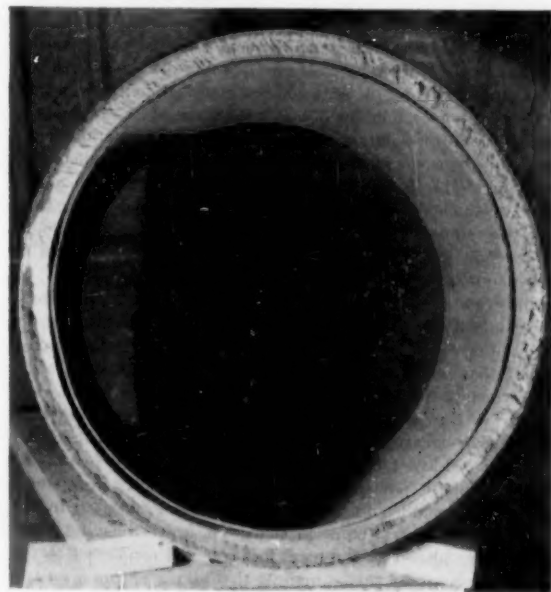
GENERAL VIEW OF TEST SPECIMEN AFTER FRACTURE
